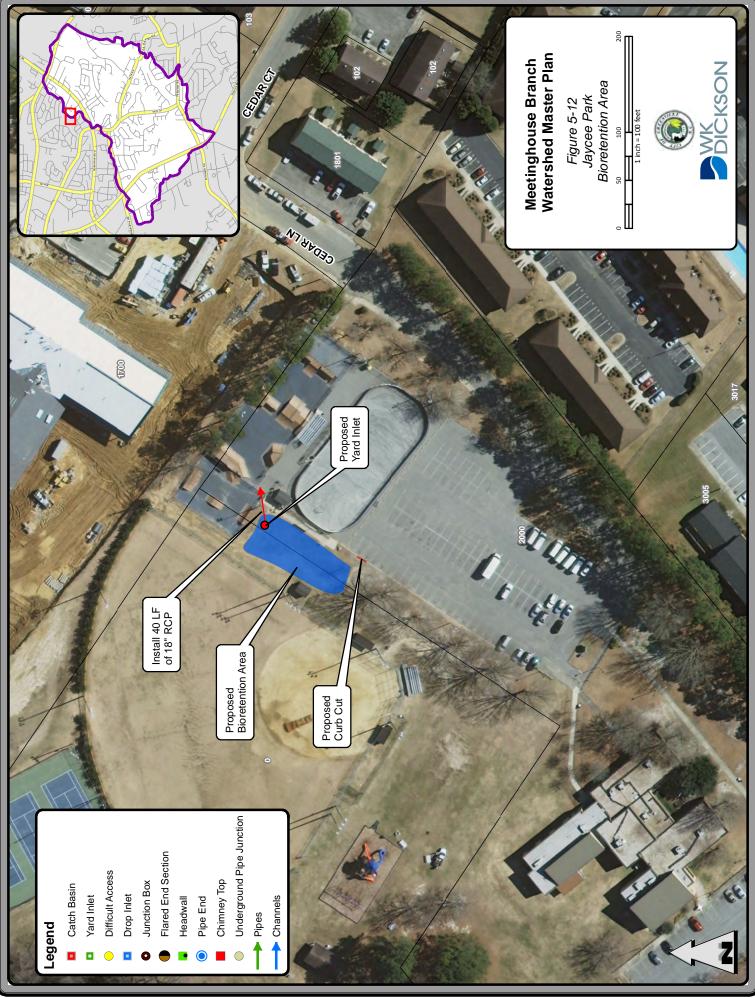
Proposed Location for Jaycee Park Bioretention Area
